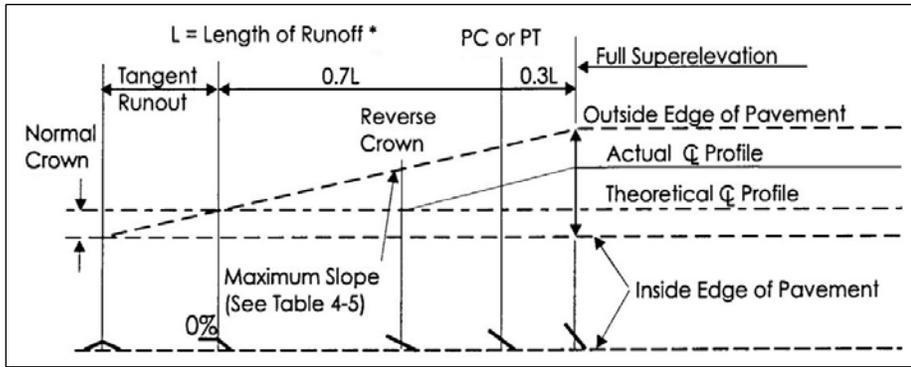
13: Superelevation Geometry – Pavement Revolved About Inside Edge
